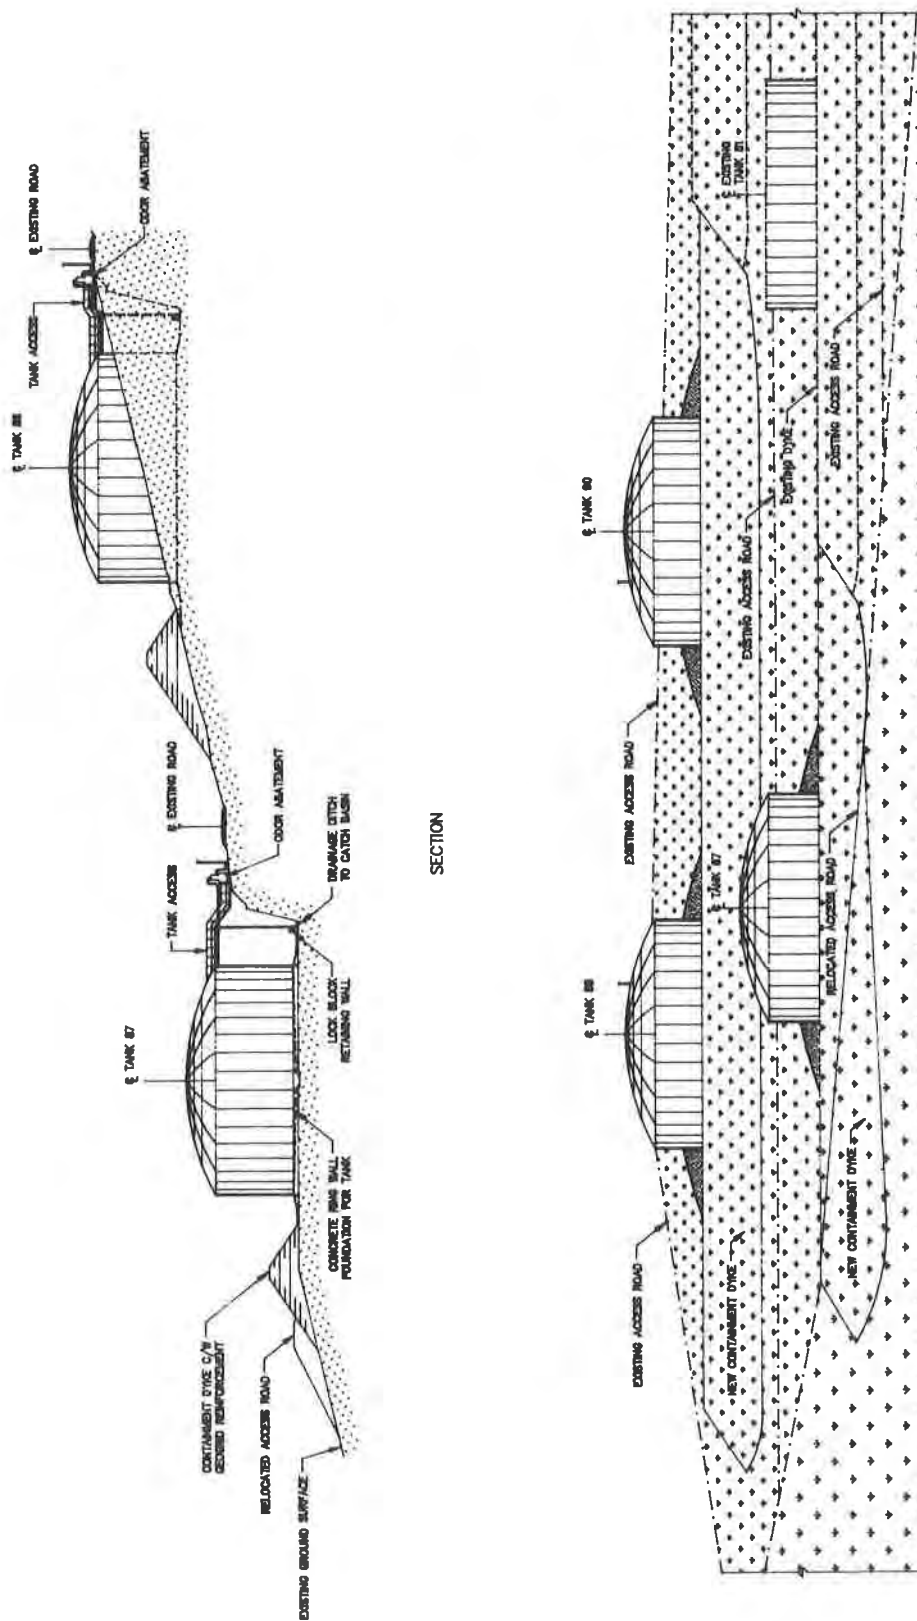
ELEVATION AND CROSS SECTION FOR NEW TANKS AND CONTAINMENT DYKING.
